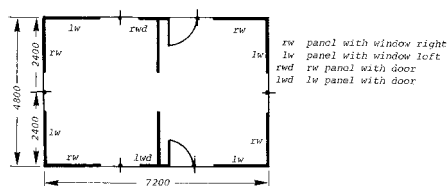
Floor plan of the prototype built and tested at James Cook Cyclone Structural Testing Station built for case study 1, image courtesy of JCU CST 2014
